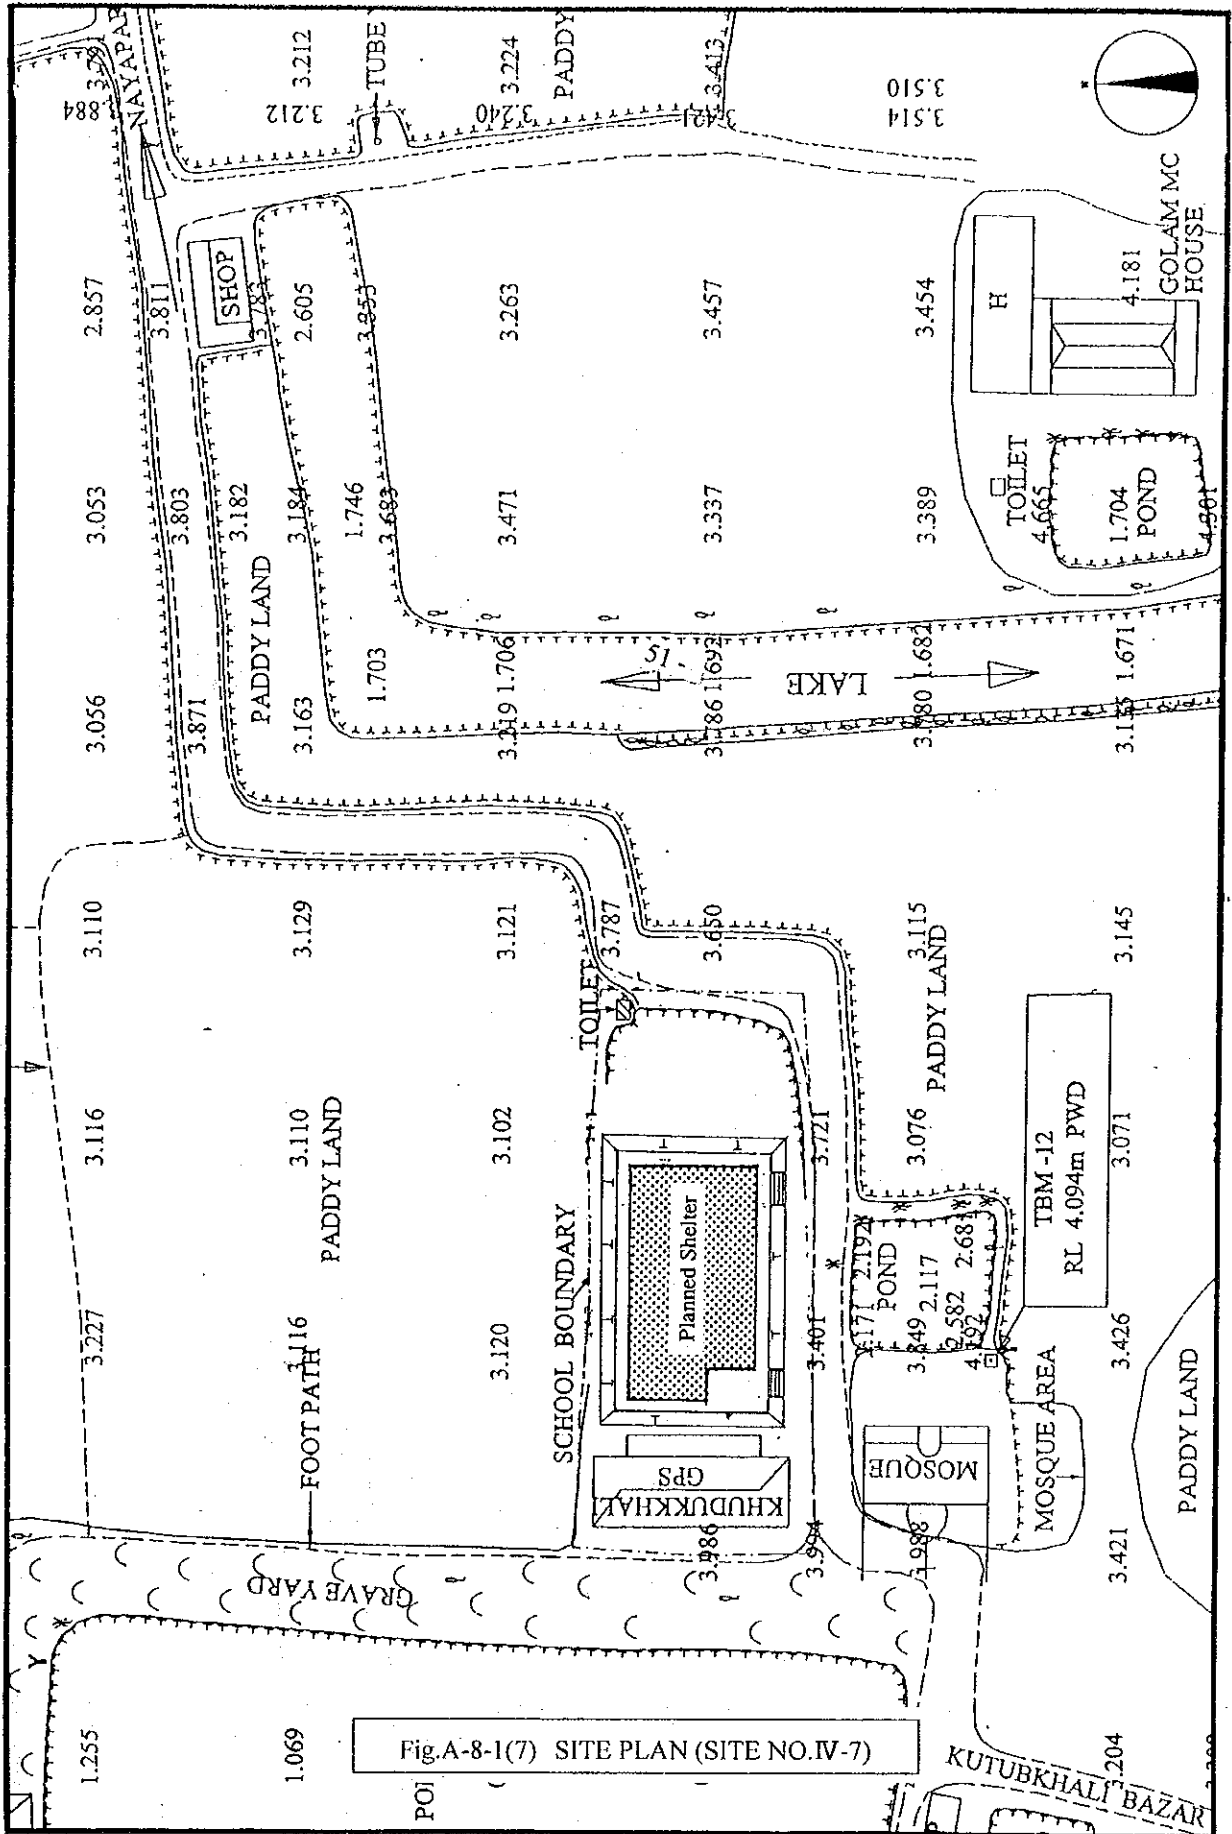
(7) SITE PLAN (SITE NO. IV-7)
